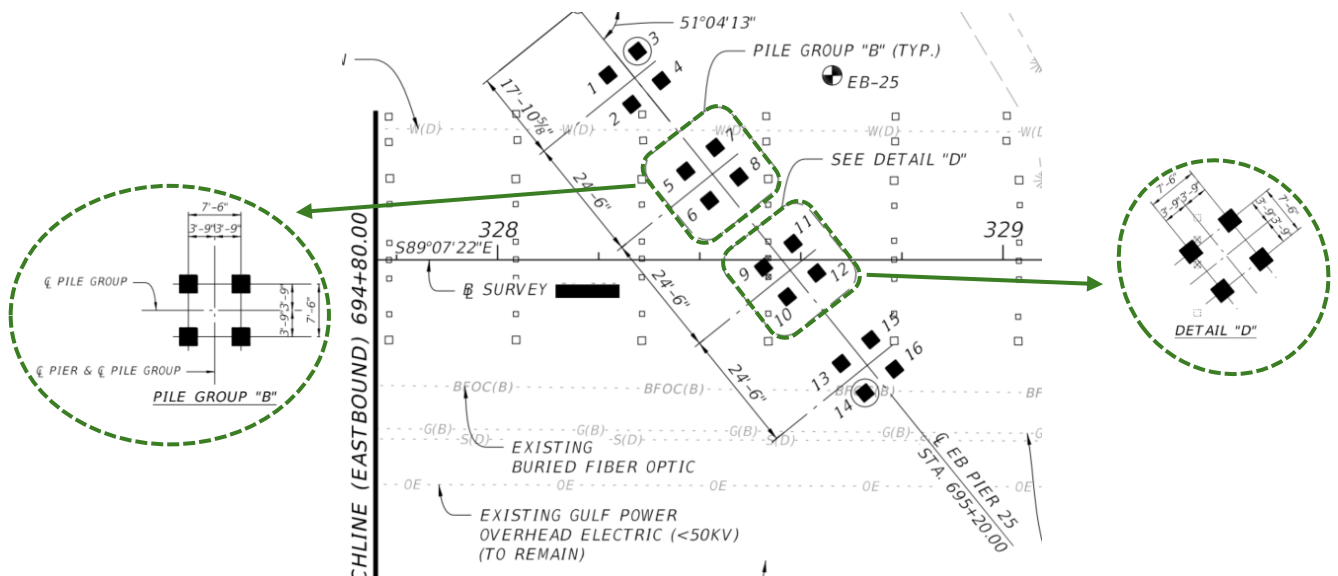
Pile group details – Selected Pier no.25 of the Eastbound Bridge (B1-84)
